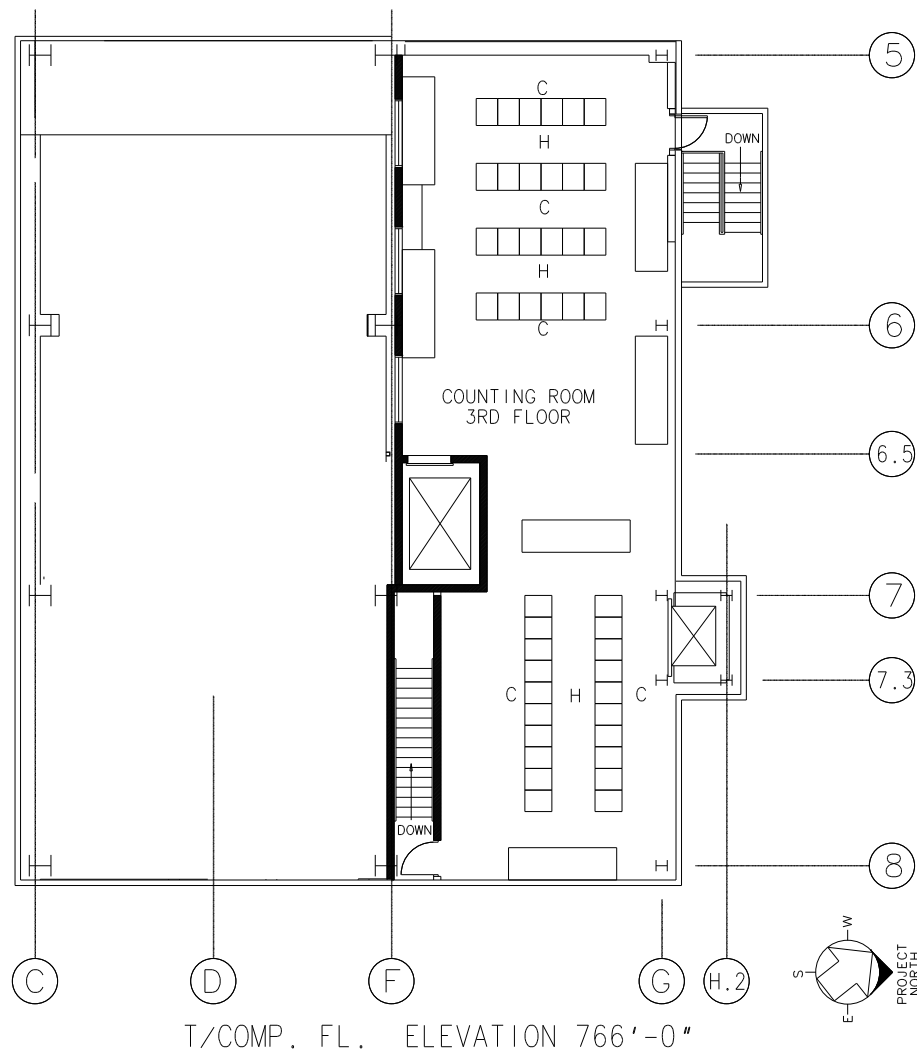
Layout of C0 Counting Rooms: Third floor.
